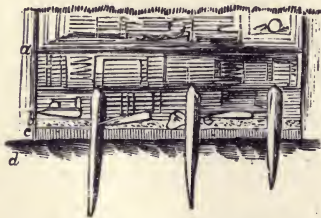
Section of a Portion of the Pile-structure in Mercurago, showing Piles and Transverse Beams.
